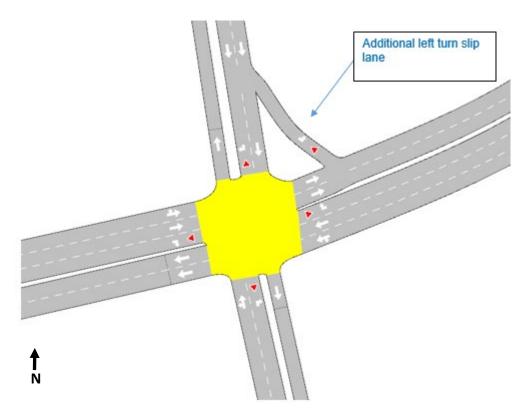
Modelled intersection layout at Townson Road and Victory Road
